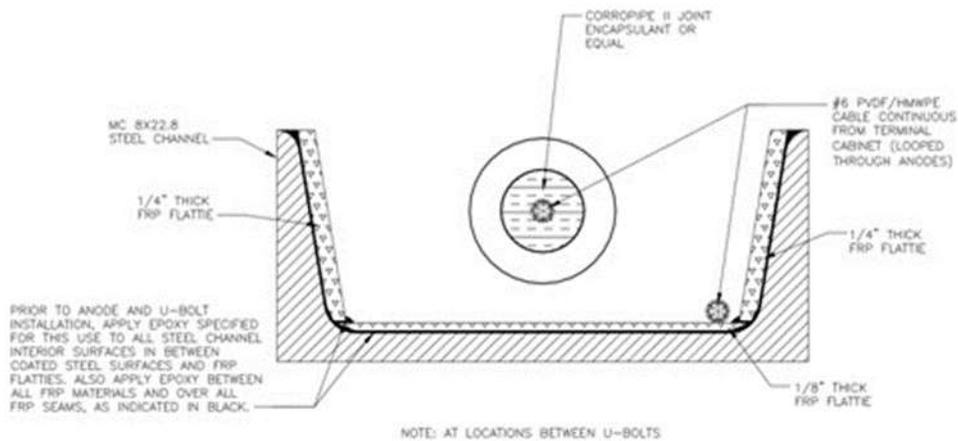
Cross-Sectional View of Anode Assembly (Locations between U-Bolts)
